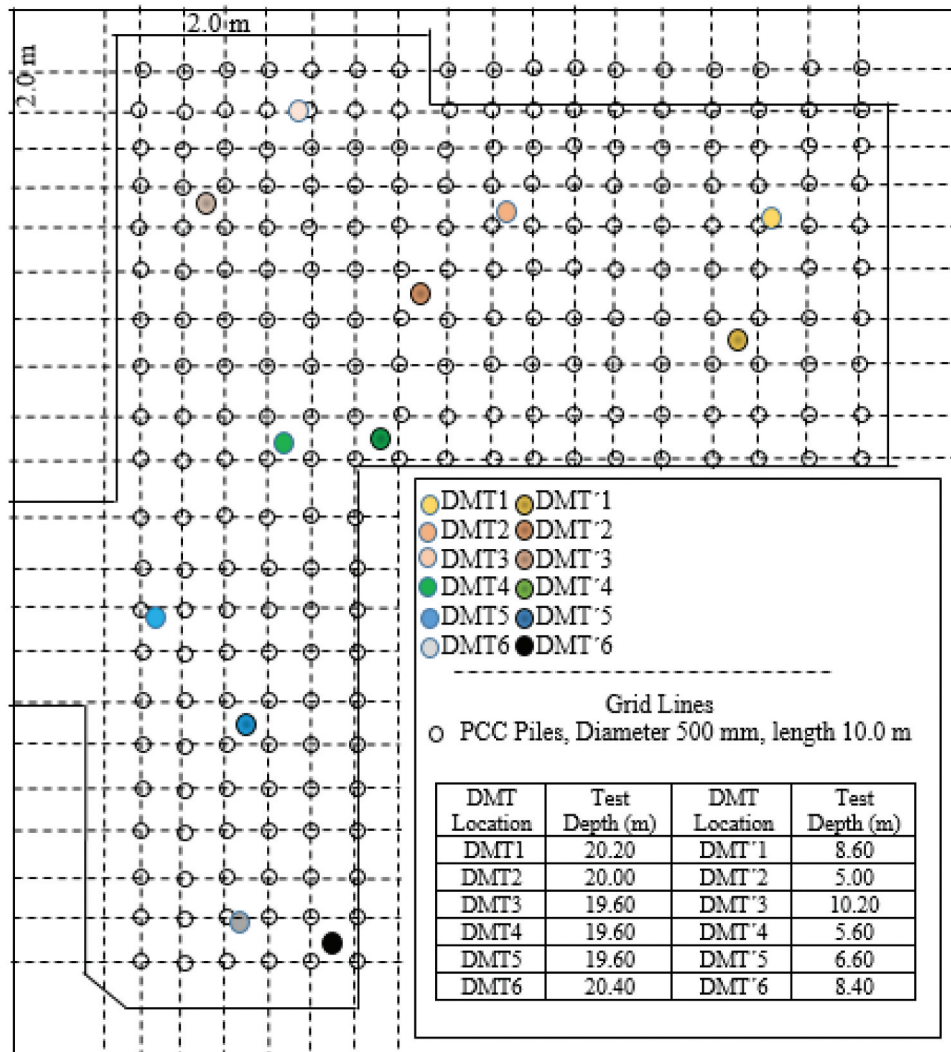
Site plan that for the test points and their depths, as well as the distribution of plain cement concrete pcc piles.
